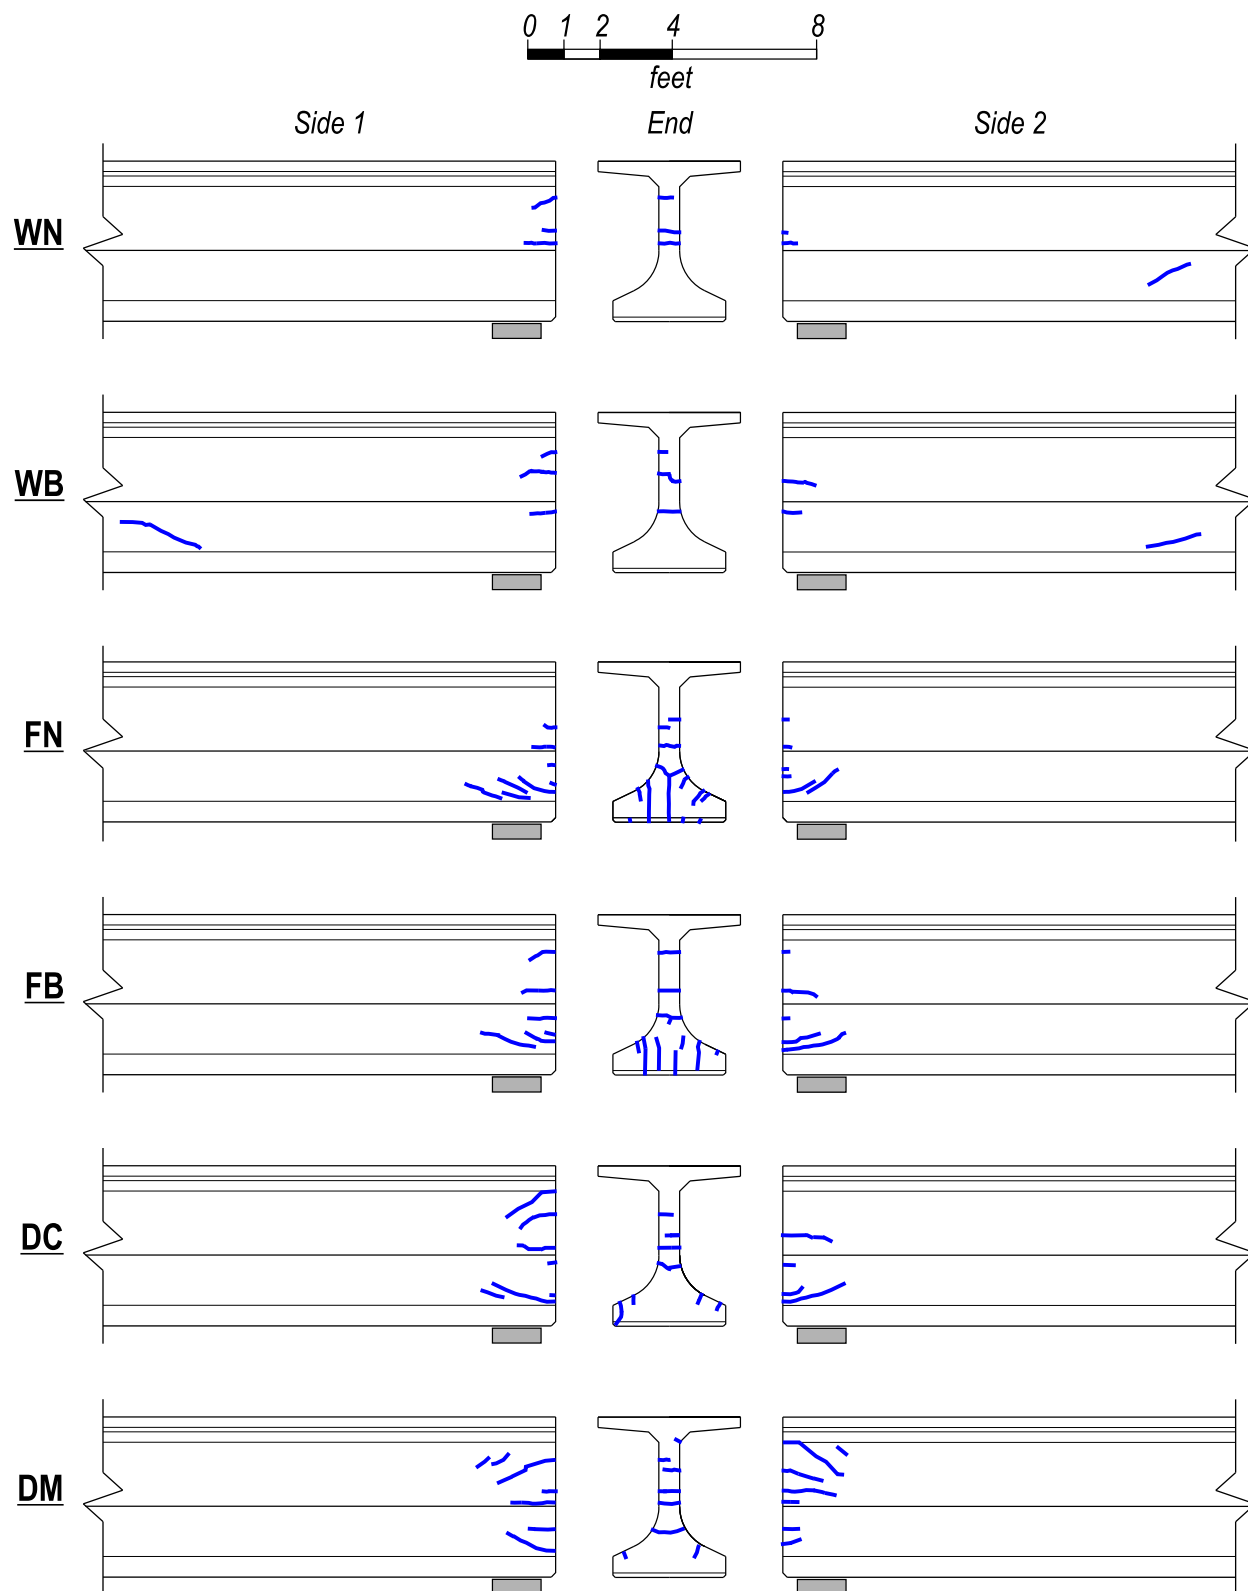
Girders W, F, and D web and flange splitting cracks
